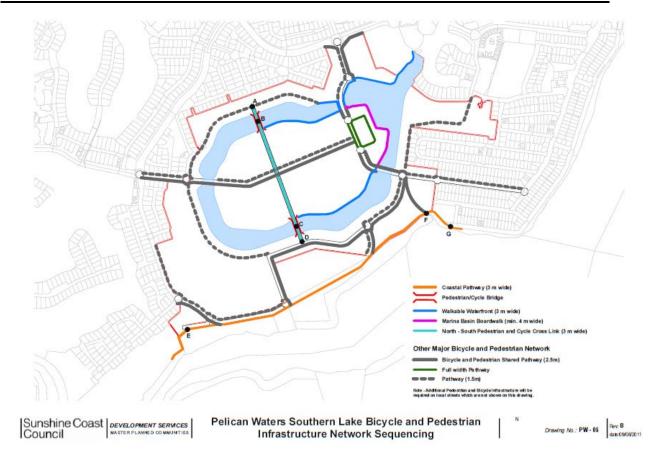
Existing Drawing 5 of Infrastructure Agreement
